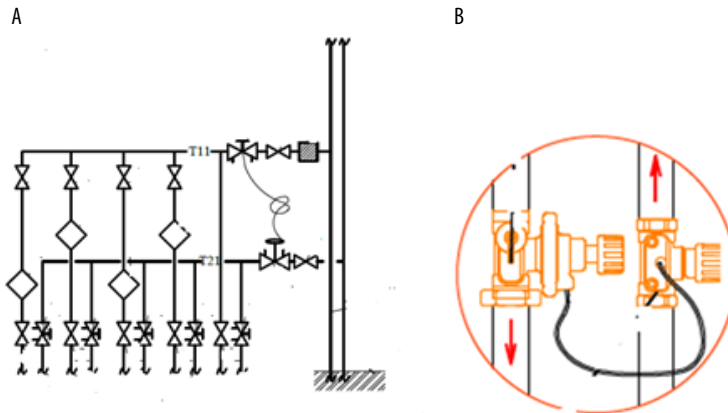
Heating system pipelines plan and scheme (Source: R. Bilinskienė's private archive)
